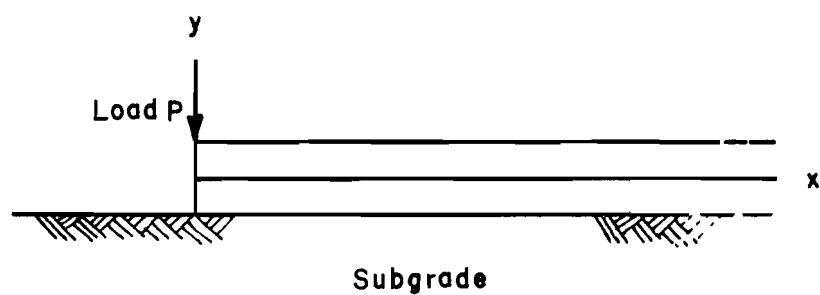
Infinite beam on an elastic foundation loaded at the end.
